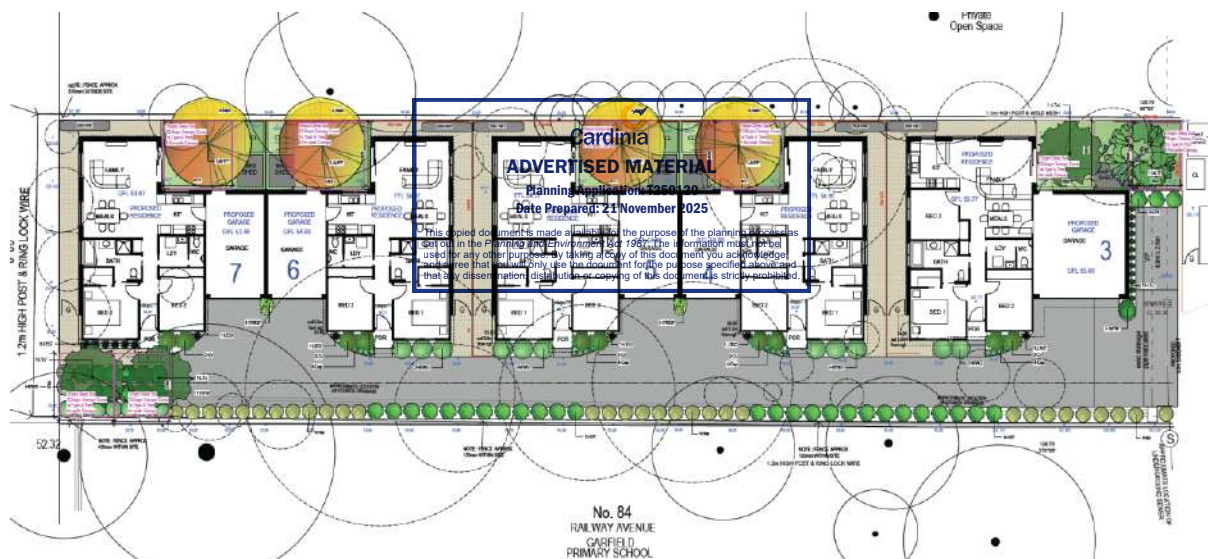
Proposed Landscape Plan (Dwelling 3-7)
